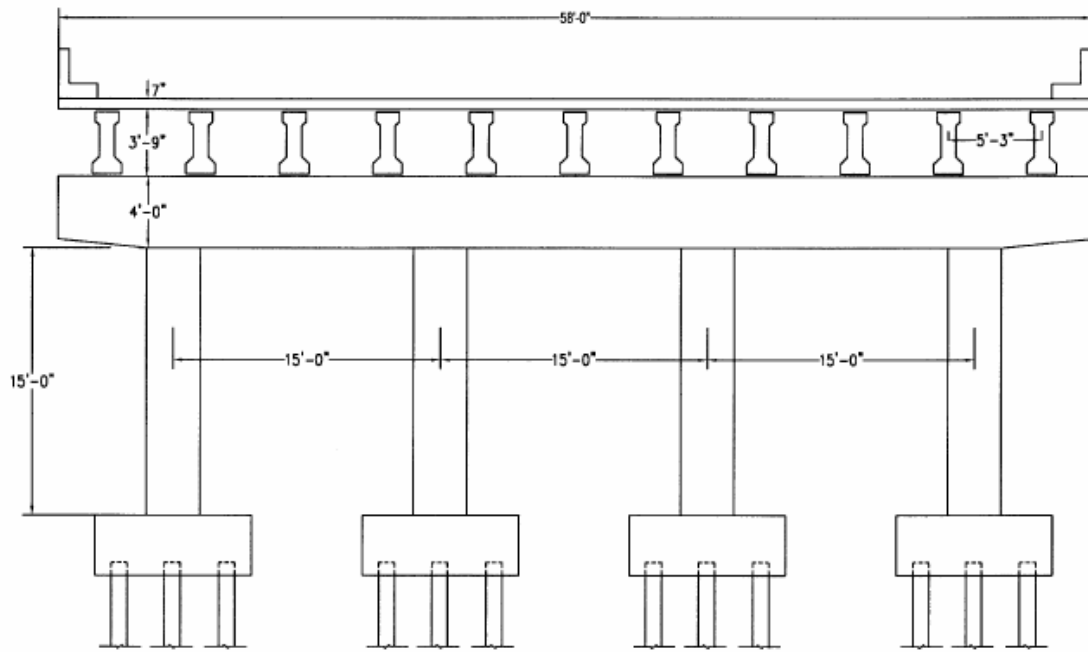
Transverse view showing cast in place concrete deck, girders, four columns bent, and column piles.(After Hwang; 2001)
